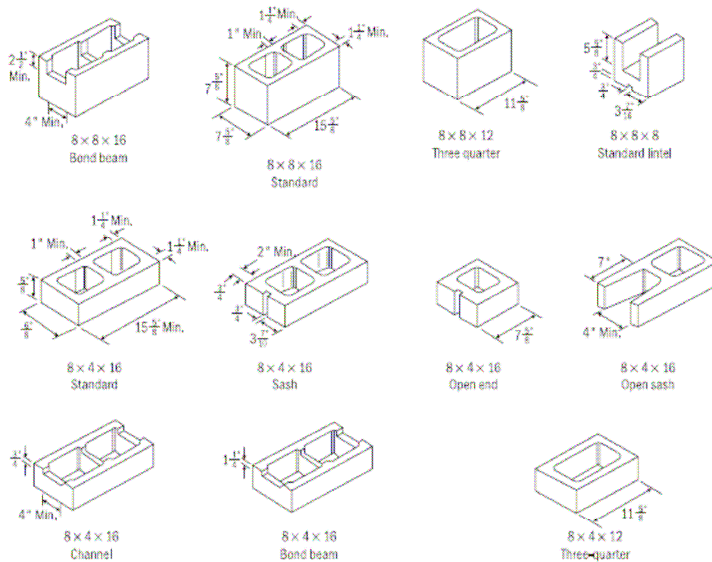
Standard types of pre-cast hollow concrete blocks
